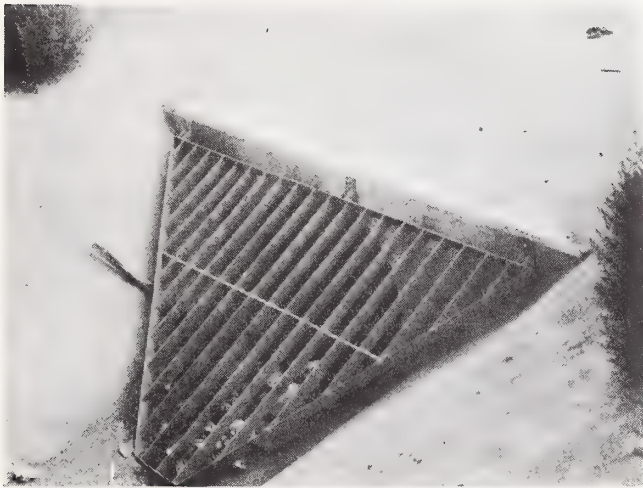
Hinged steel debris rack in urban area. Due to nature of debris and possible entry by children, bar spacing is close.
